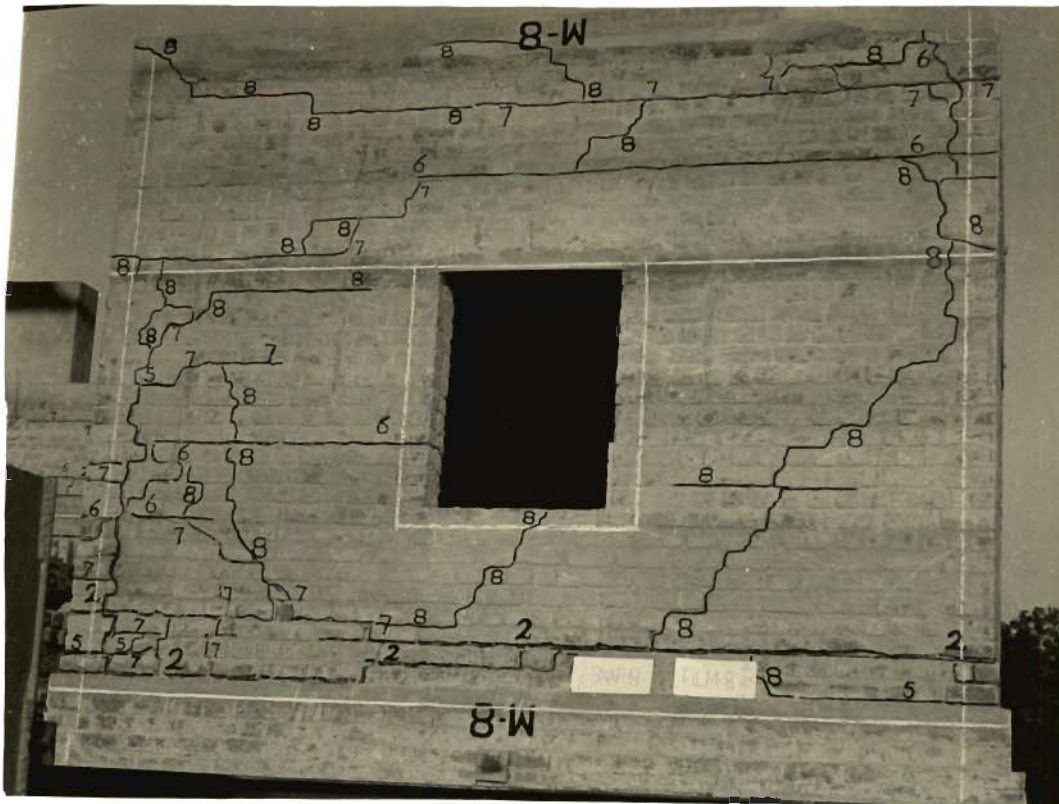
\_WEST CROSS WALL SEVERLY DAMAGED DURING SHOCK NO.8 (MODEL 8)
